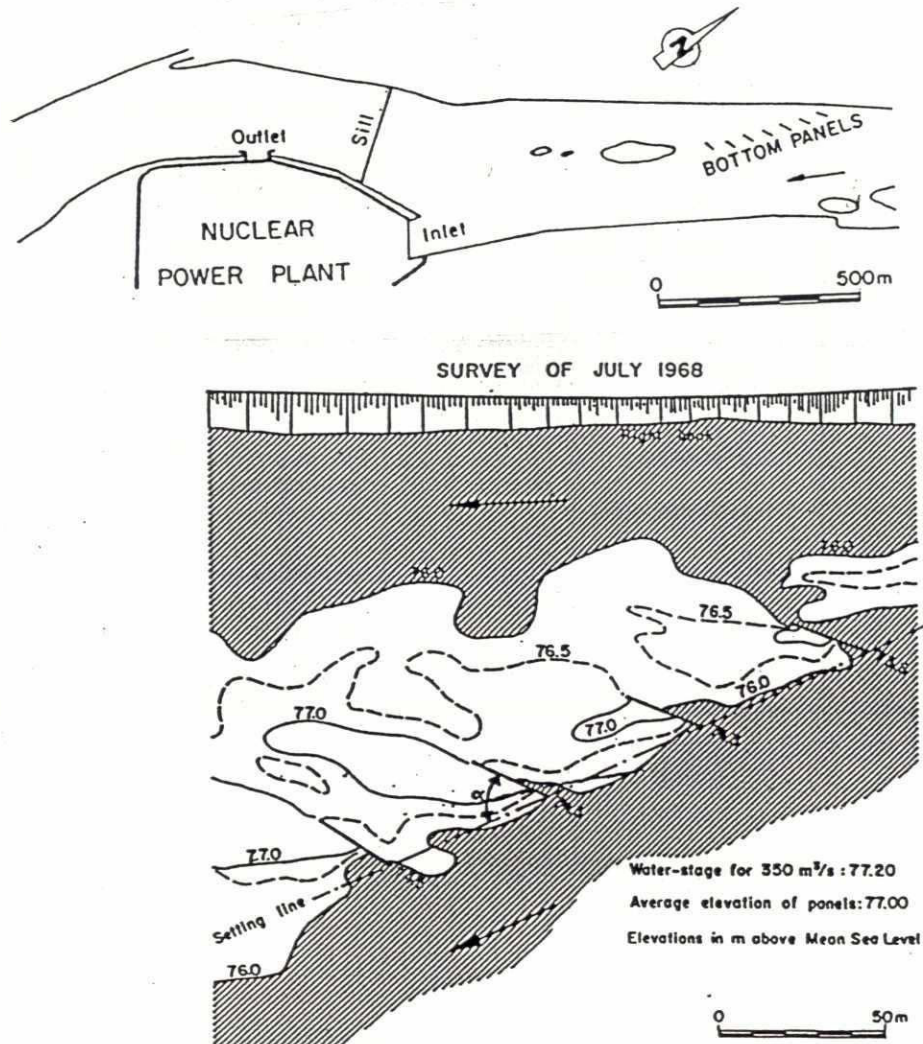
Bottom level elevations due to bottom vanes 6 months after construction
